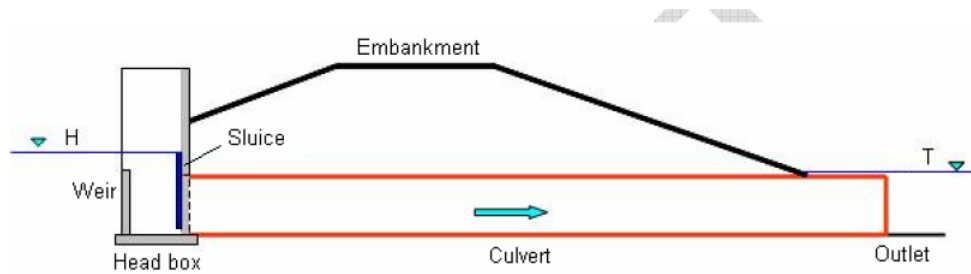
G304 head box and culvert layout (after Gonzalez, 2005)
